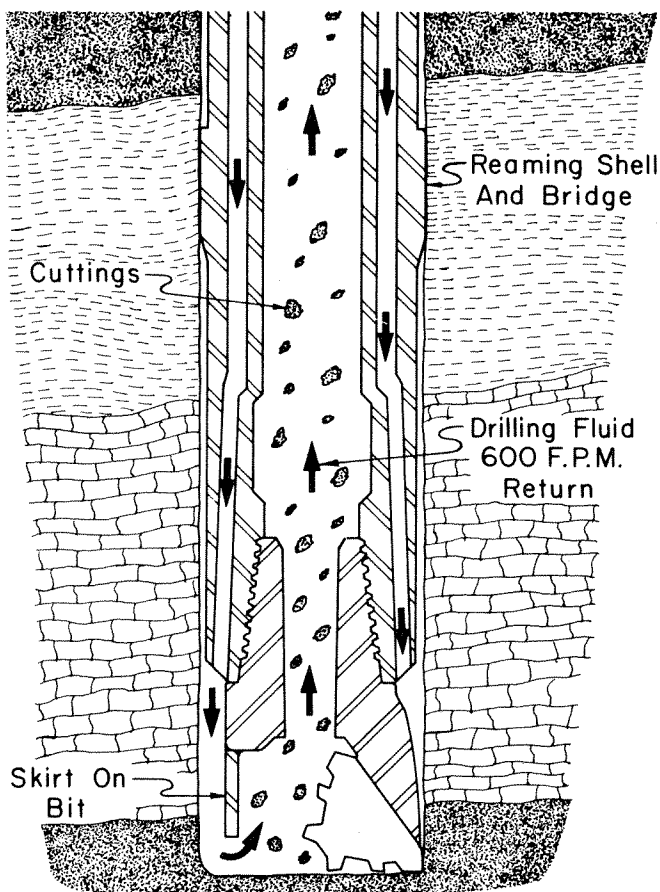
Reverse circulation drilling system: rock cuttings carried to surface through drill pipe.
